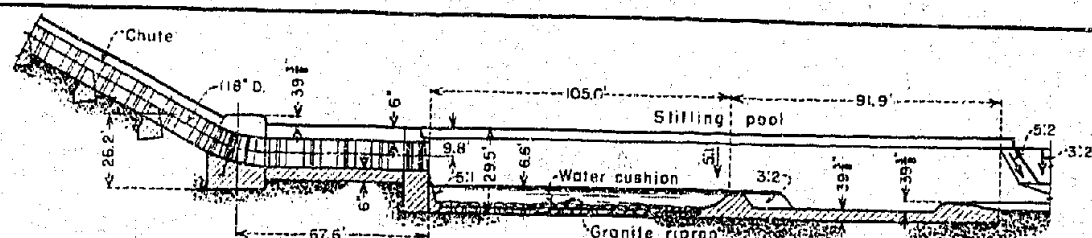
PLAN AND PROFILE OF FLORENCE LAKE TUNNEL SHOWING SCOUR
